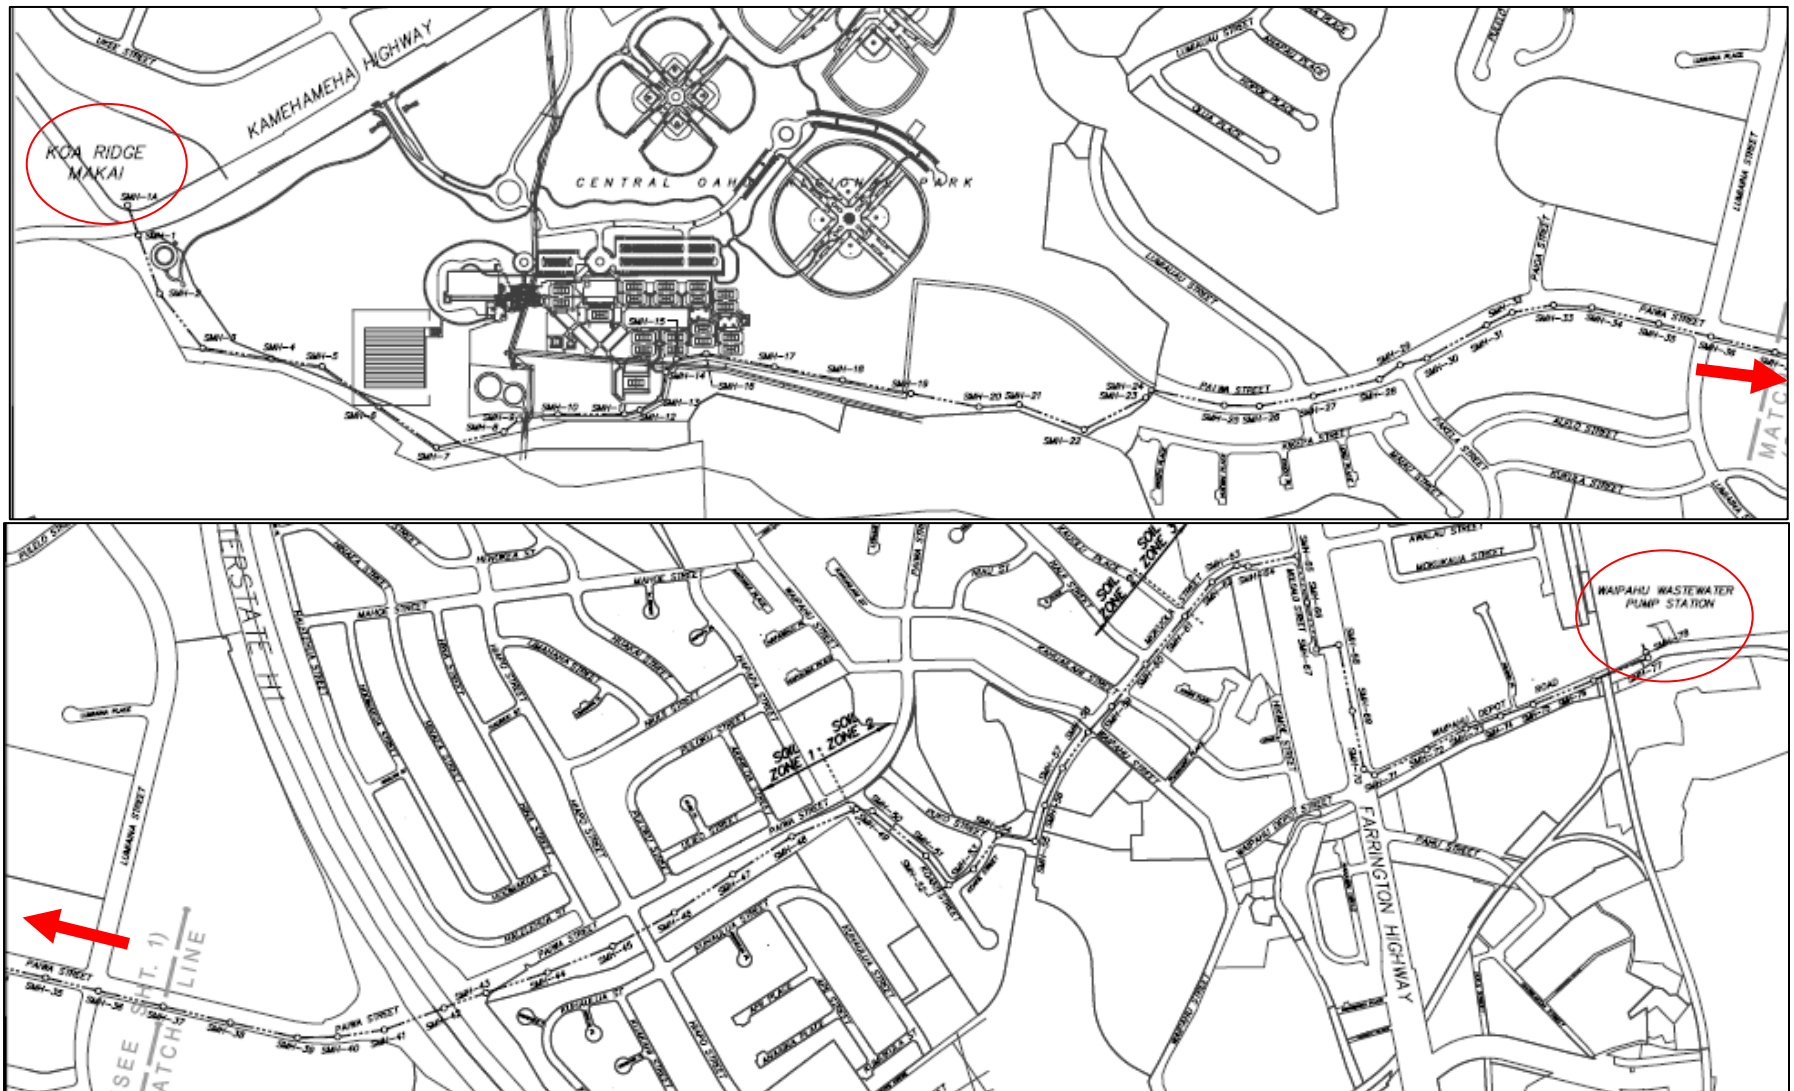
Koa Ridge Makai proposed alignment of sewer trunk line. (from Park Engineering sheets 1 and 2)
